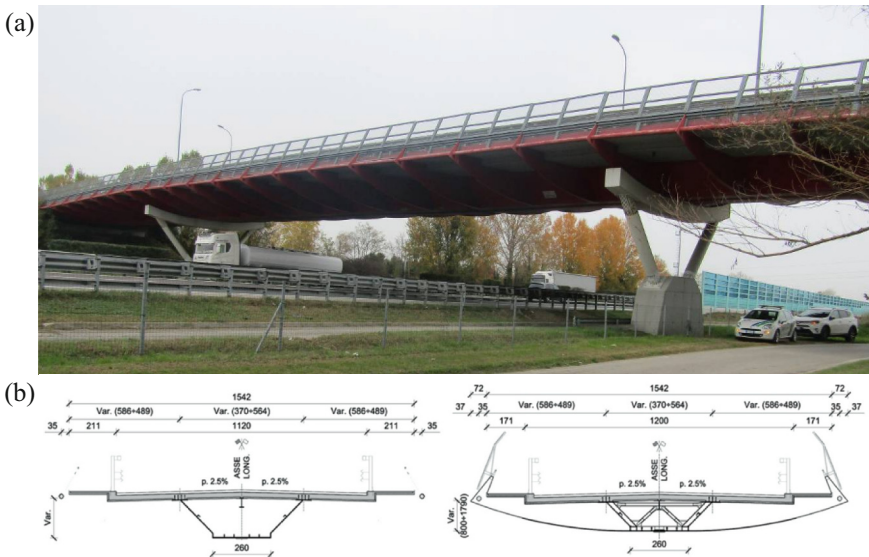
View (a) and transversal cross-sections (b) of the *Dolo* overpass (dimensions in cm).
